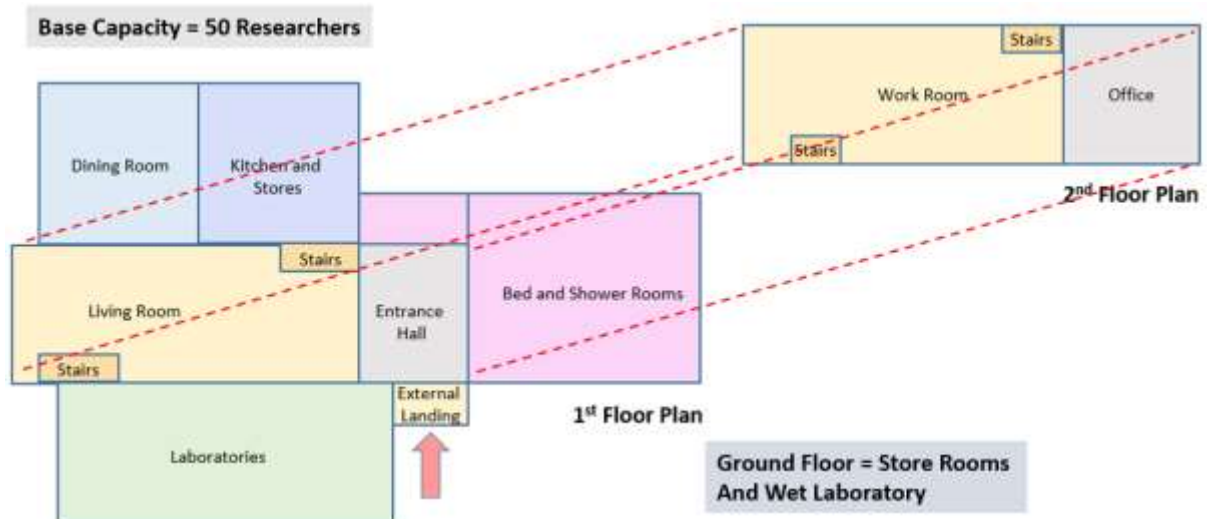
Sketch floor plan of the first and second floors of the Julio Escudero Base.
